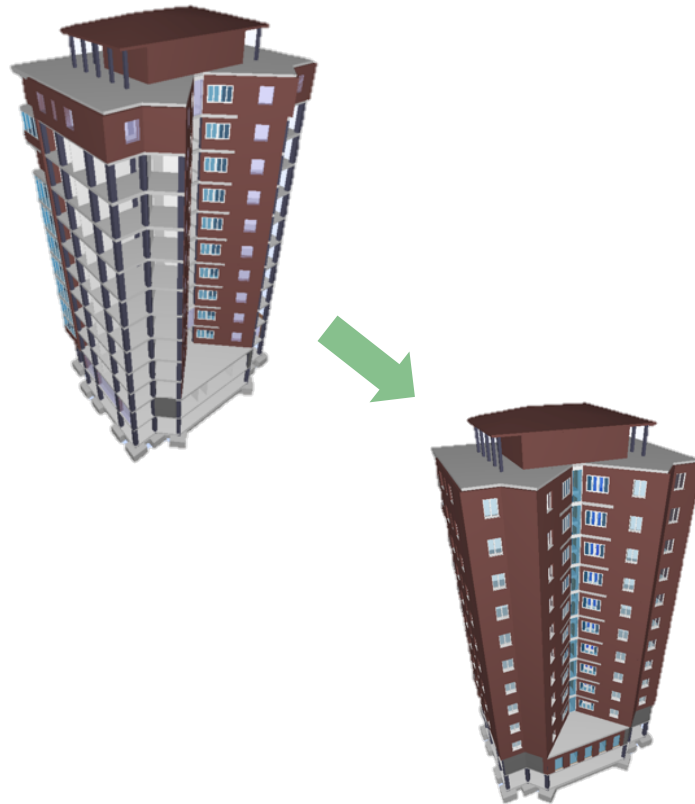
Edit the construction (material layer bedding) of opaque building elements
